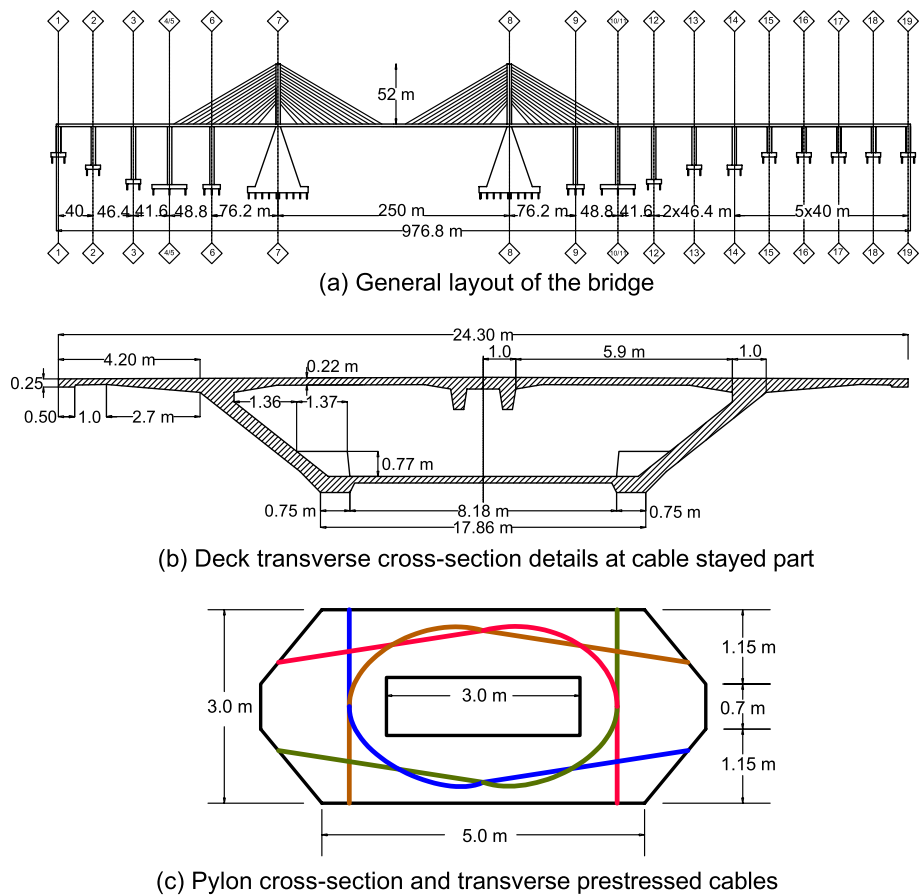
General layout and typical cross sections of Aswan Cable-Stayed Bridge. a General layout of the bridge. b Deck transverse cross-section details at cable-stayed part. c Pylon cross-section and transverse prestressed cables
